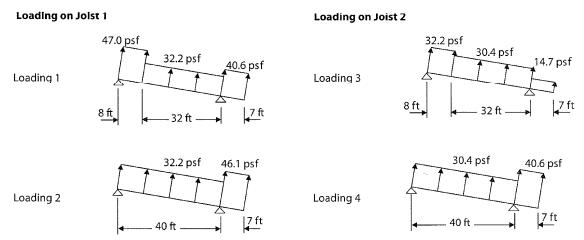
Design Pressures for Typical Joists and Pressure Zones for Roof Components and Cladding
